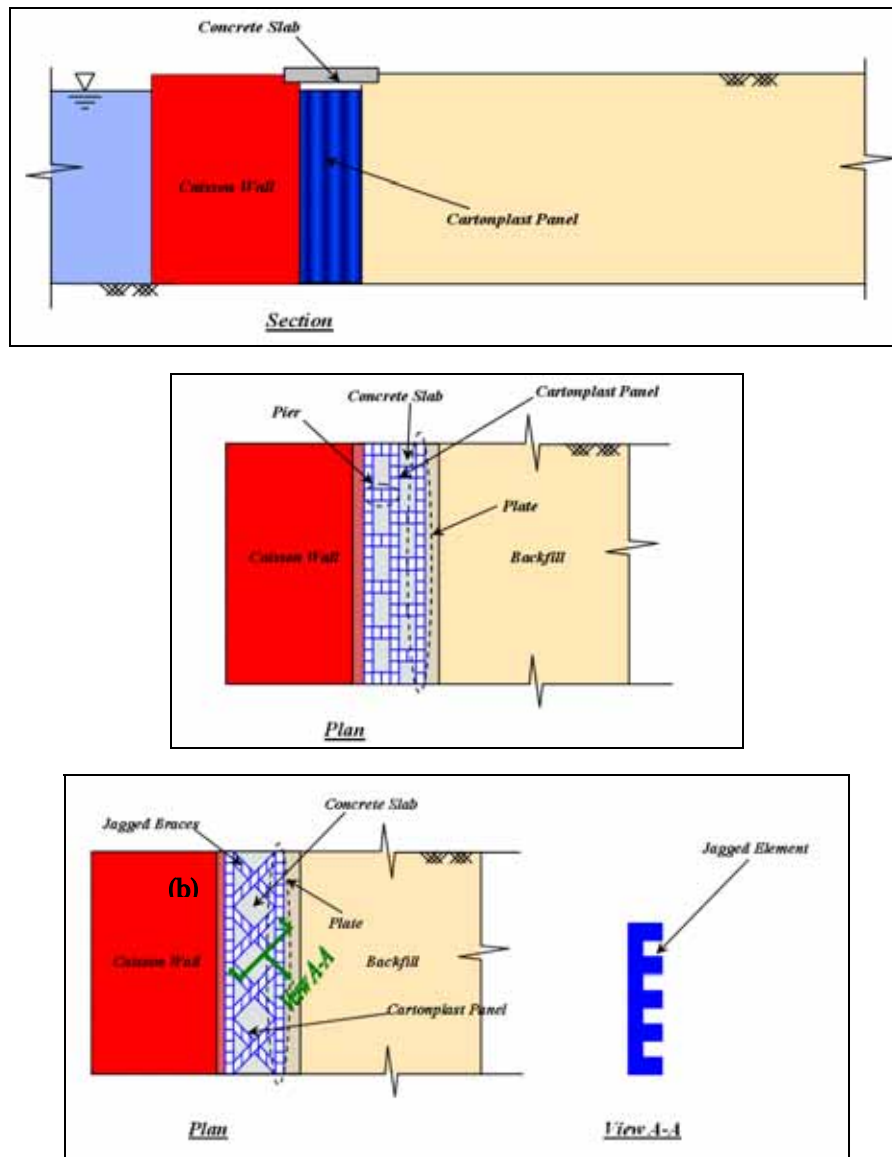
Schematic view of the application of cartonplast panels at the back of the quay wall: (a) Section, (b) Pier-plate system type in plan, (c) Jagged-bracing system type in plan
